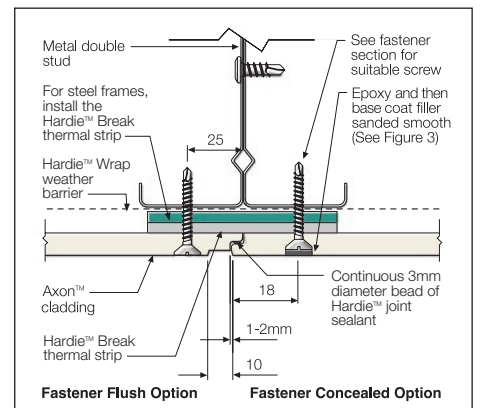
SHEET JOINT ON STEEL: FLUSH AND CONCEALED FIXING OPTIONS
